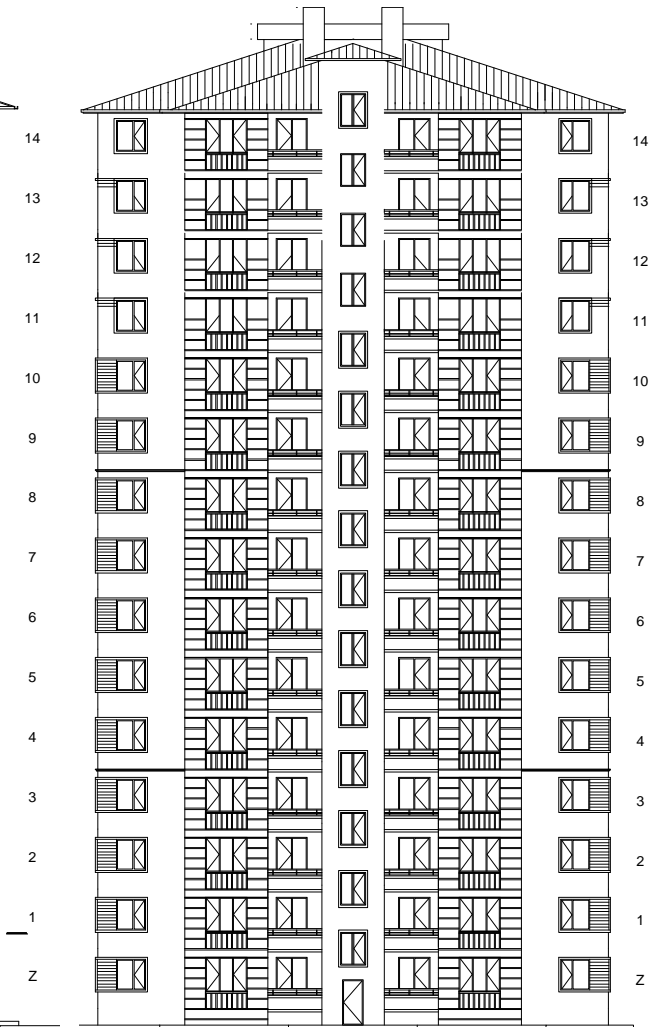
Elevation of a building with 100m<sup>2</sup> dwellings
